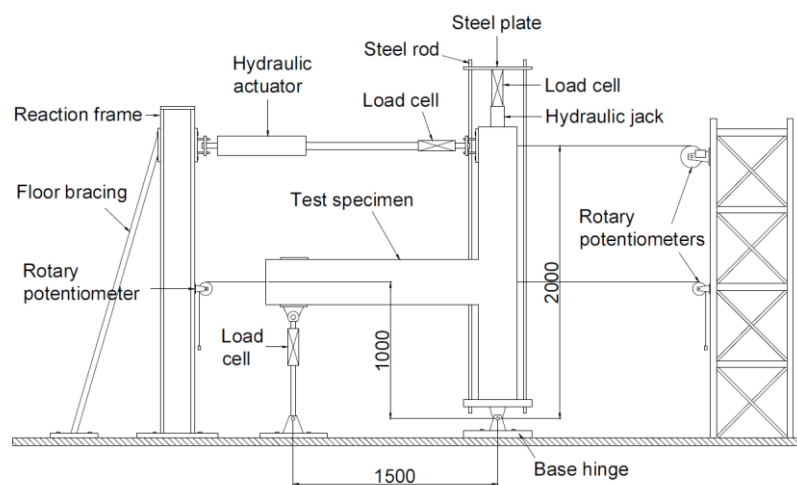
Two-dimensional beam-column connection subassembly test (Au, 2010).
